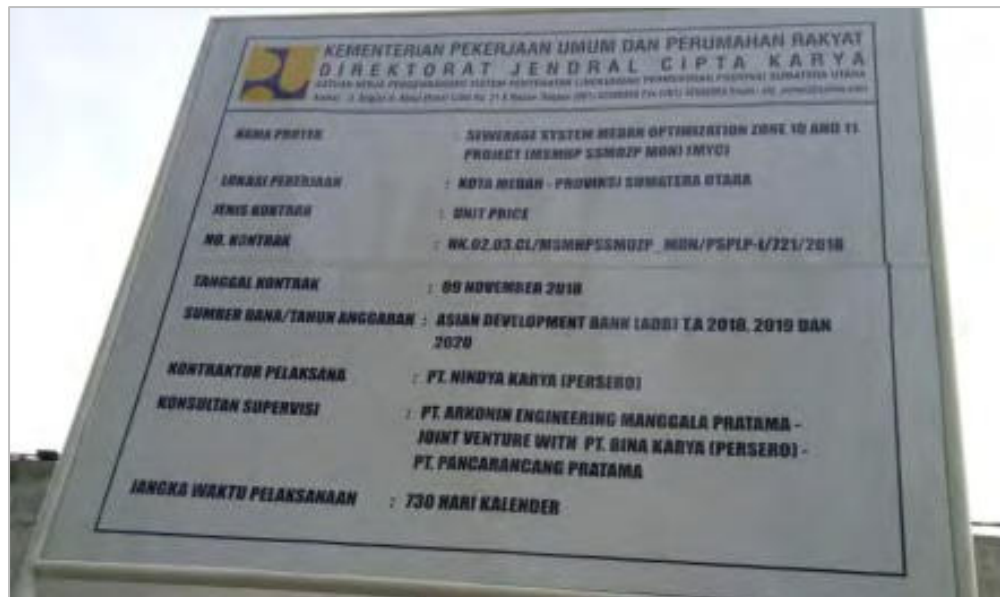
Billboard on Construction Sites, Displaying Brief Information Regarding The Project
